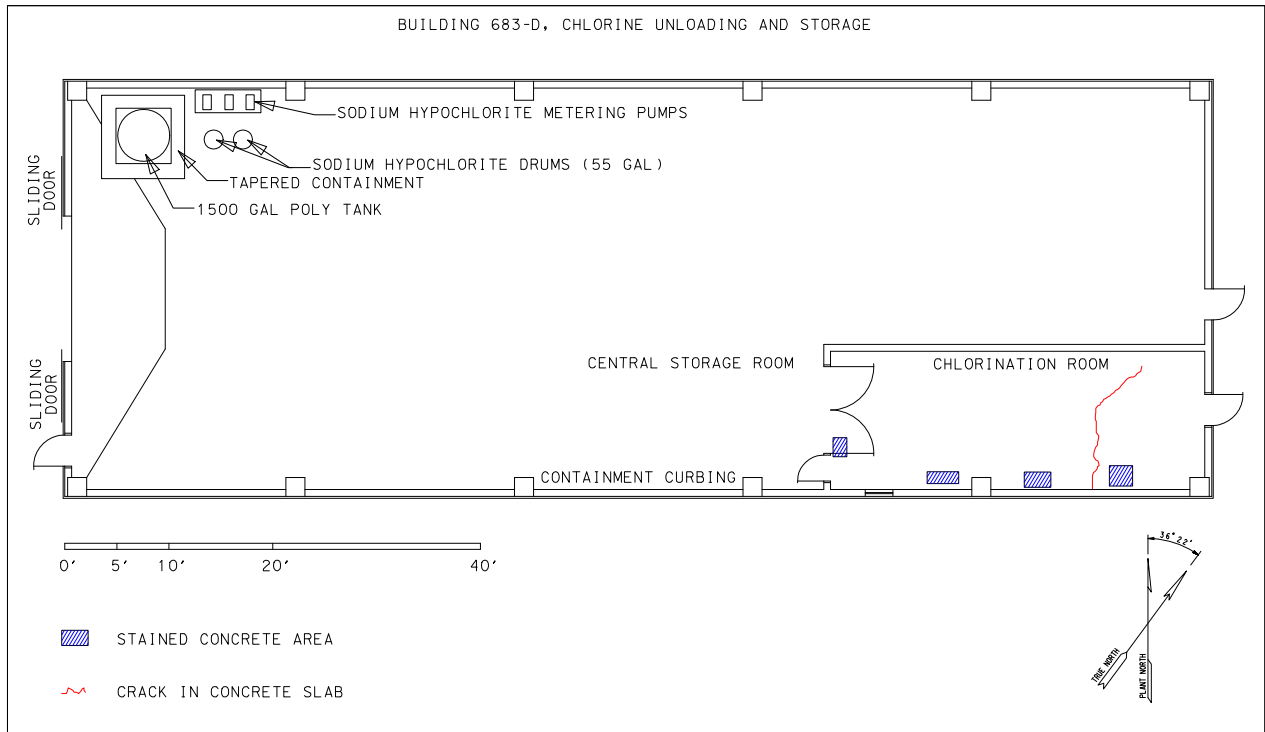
Building 683-D Layout (Showing Stains and Crack)
